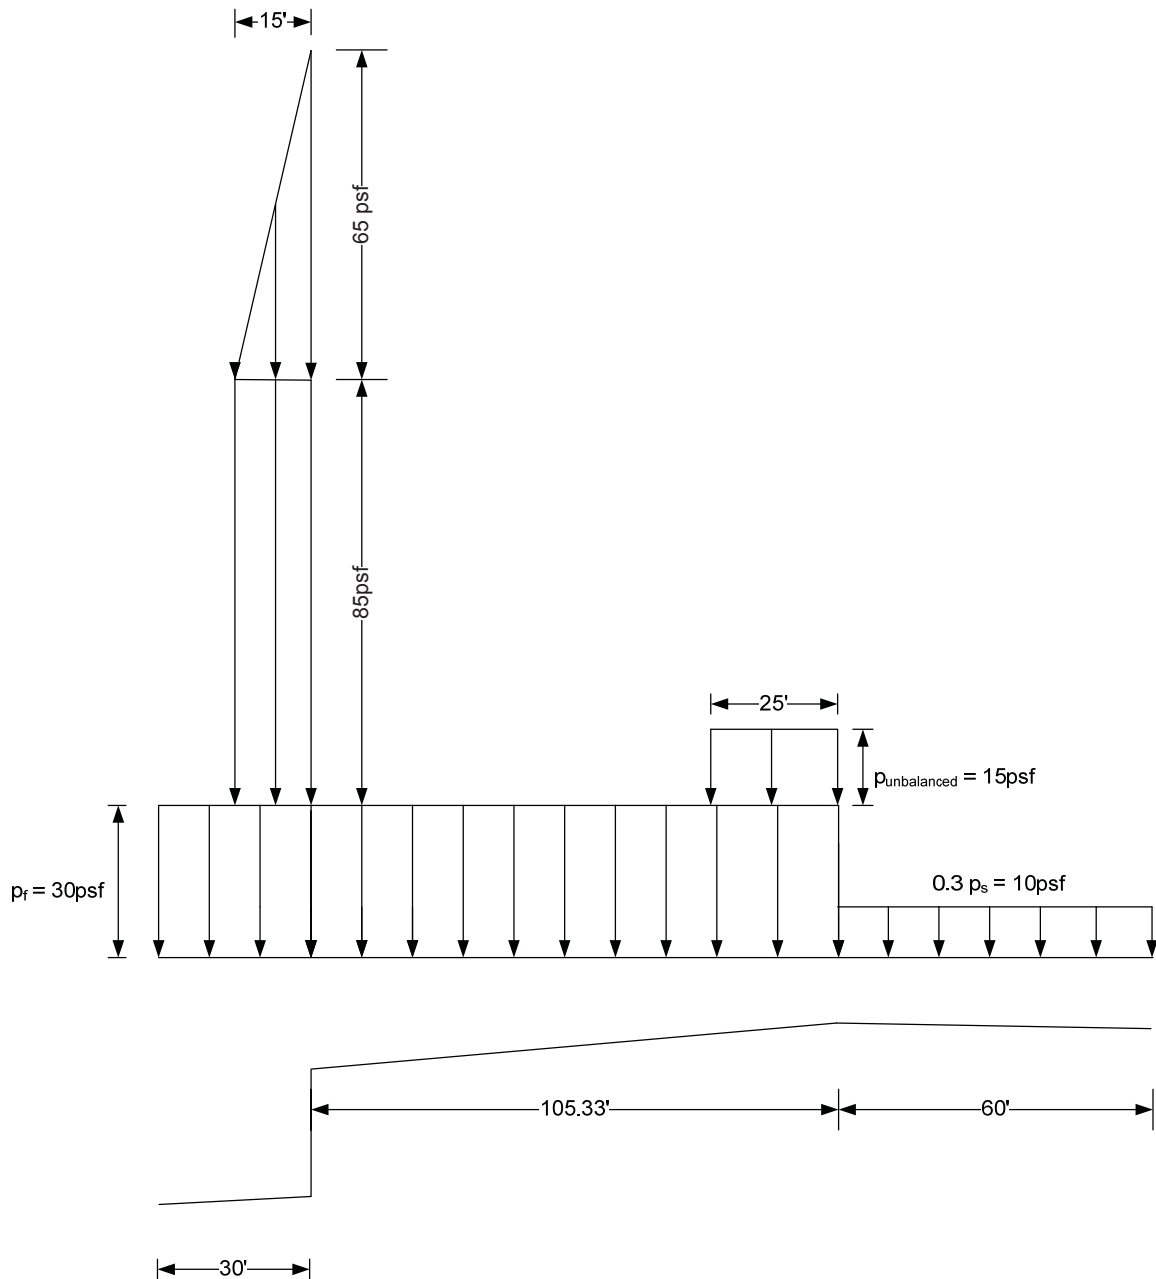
Case 3: Unbalanced Snow Load for West Direction Sloping Roof with Drift Load and Sliding Load on Lower Roof
